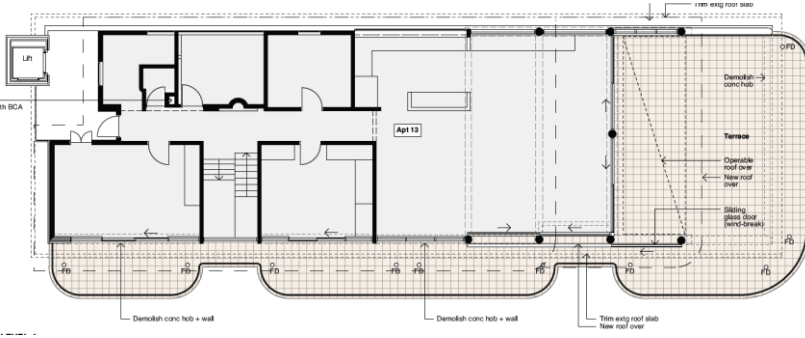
Proposed fourth floor plan in PL/39/2021 – 10 Major Street, Coogee (Source: Ken Powell Architect)
